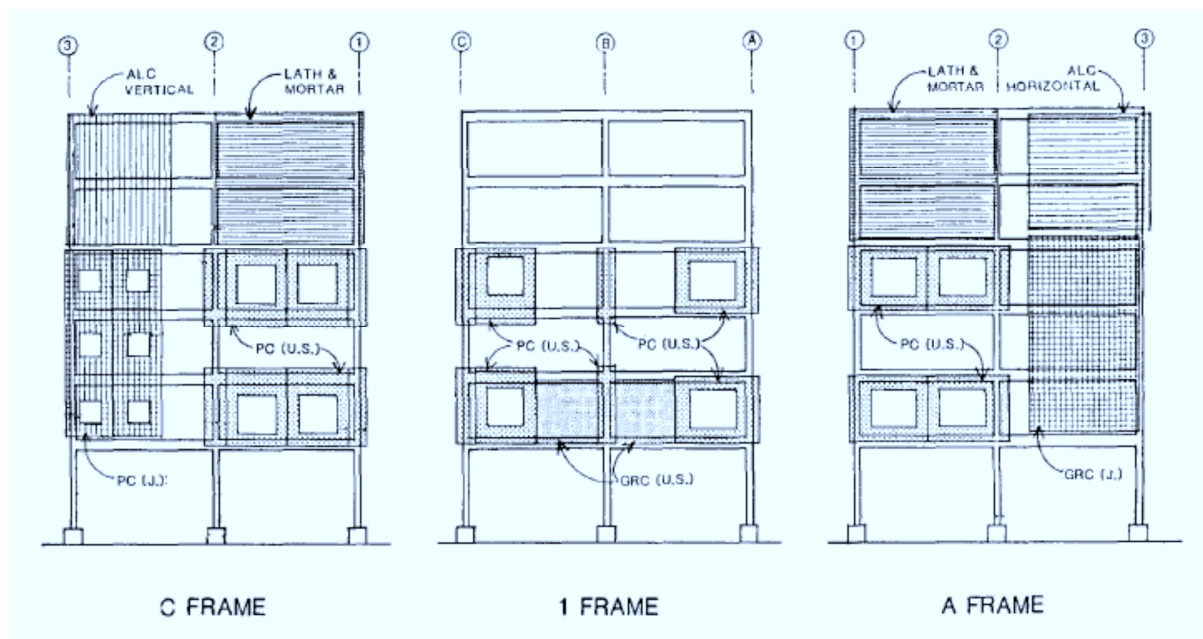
Elevation of frame with US and Japan cladding elements (Wang, 1987)
